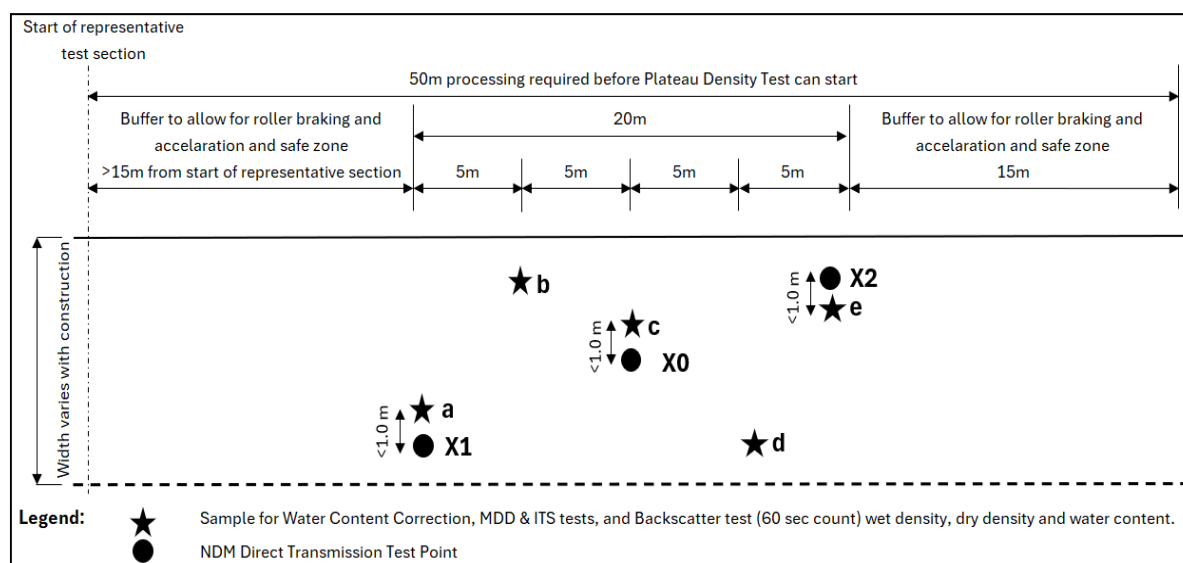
Test Section minimum dimensions for a grader, lane width or full road width process (generally NZTA B02, B07 or B08 specification).
